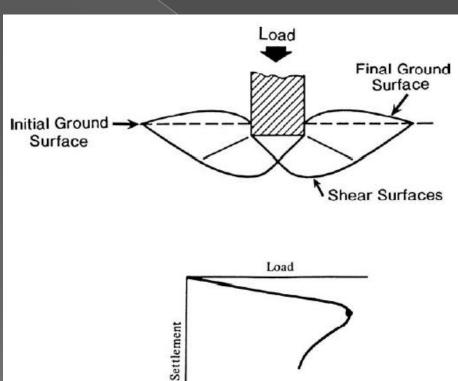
General shear foundation failure. (After Vesić, 1963.)
